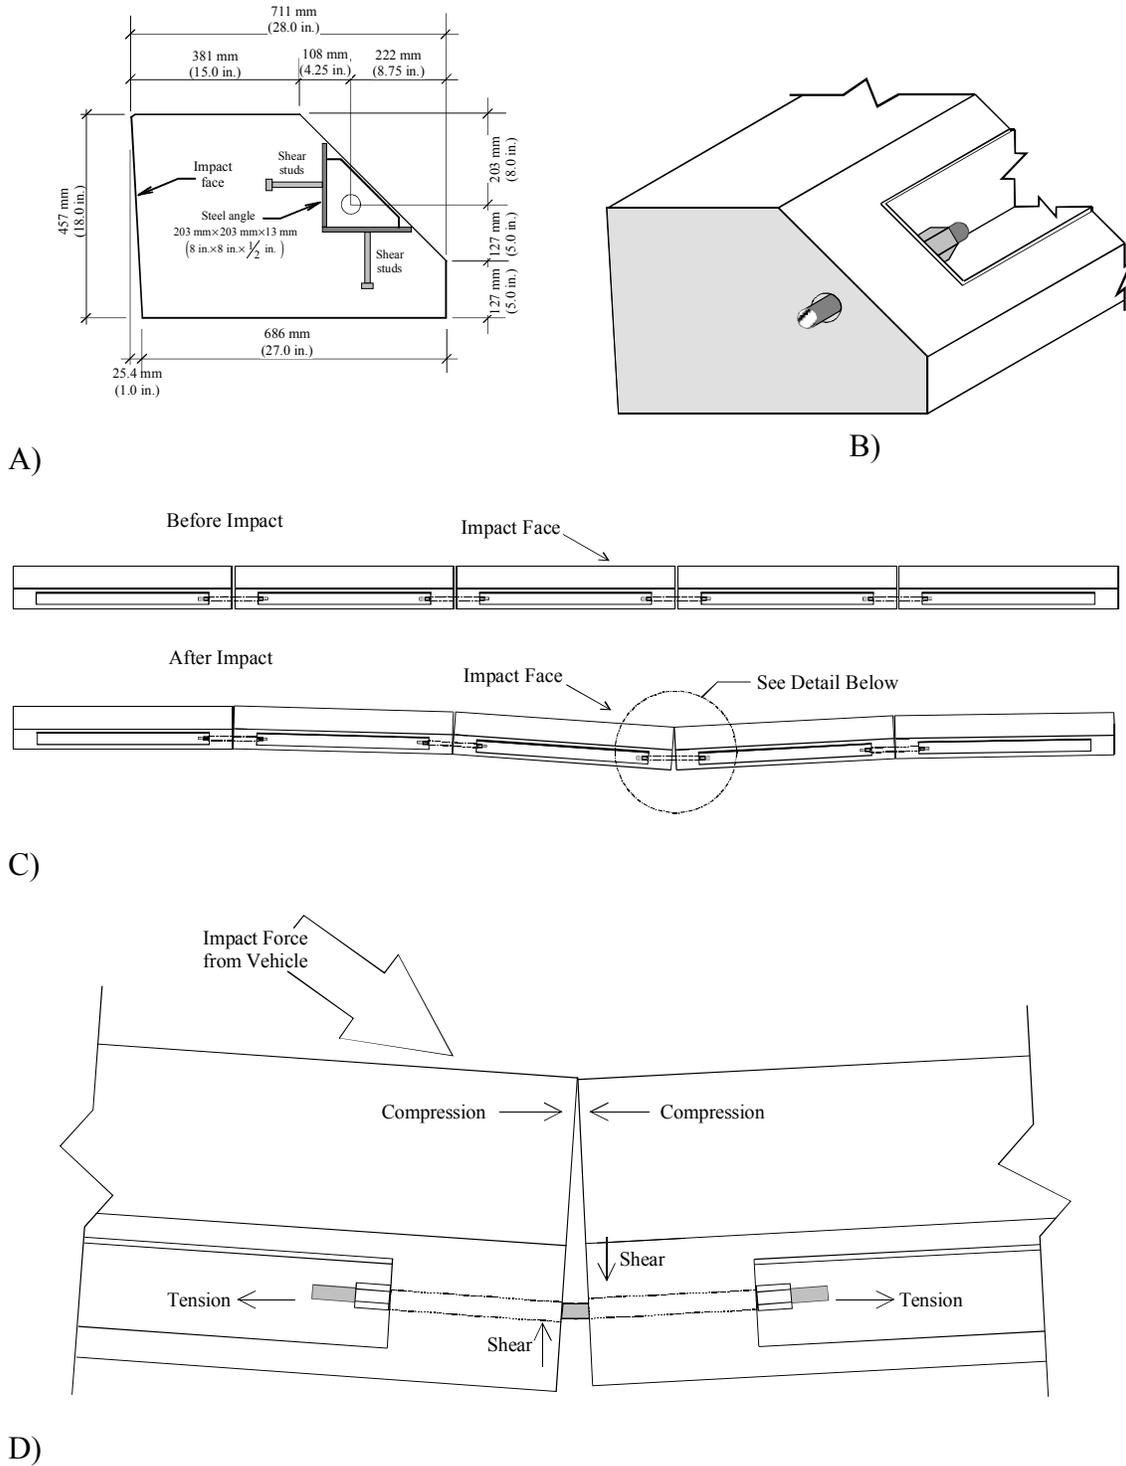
Straight-line barrier system A) Cross-sectional shape of barrier B) End view of barrier C) Plan view of multi-segment barrier D) Segment-to-segment forces transmitted during an impact event
